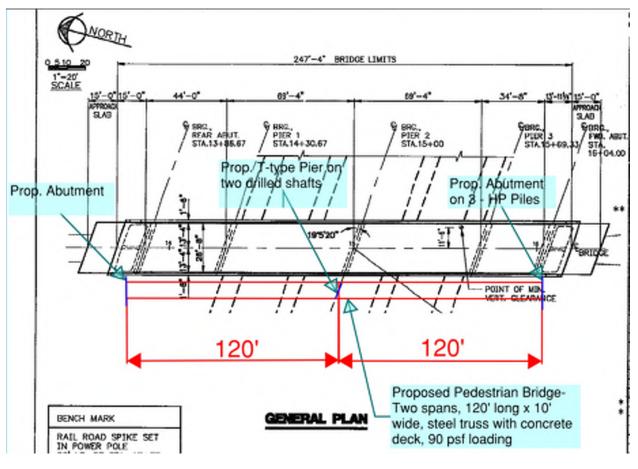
Proposed Pedestrian Bridge - Plan View MP 182.1
